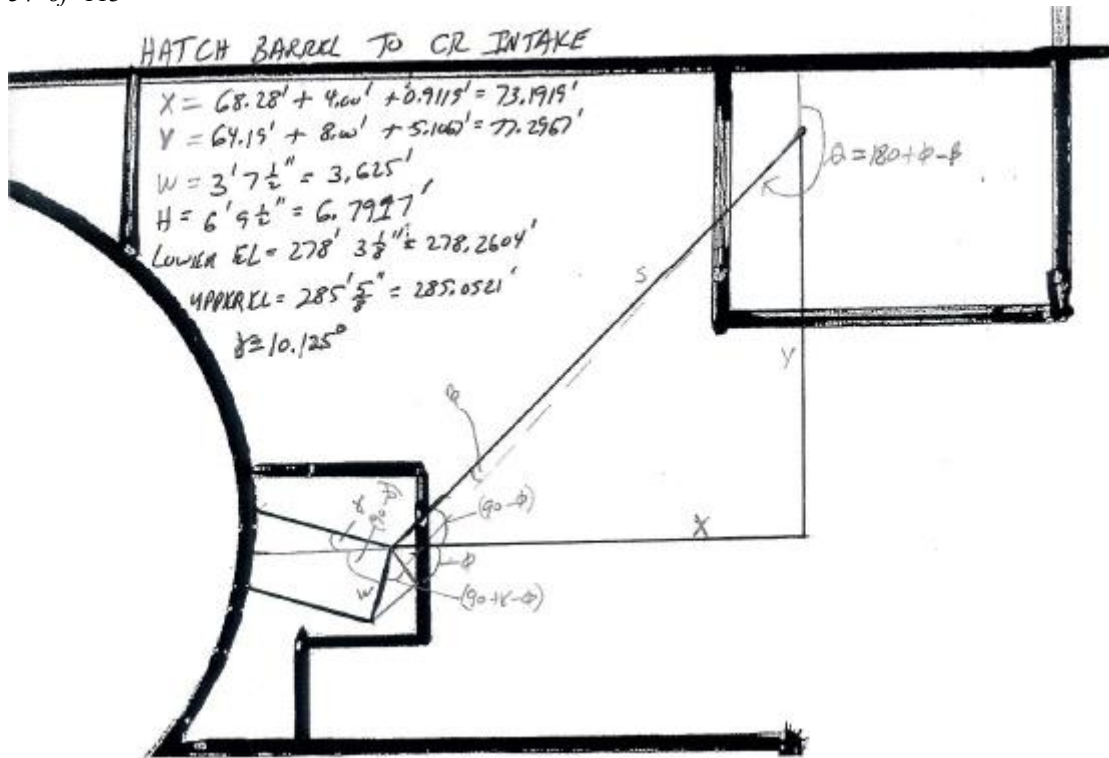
Equipment Hatch Barrel Access Door (Area Source) to Control Room Inlet
